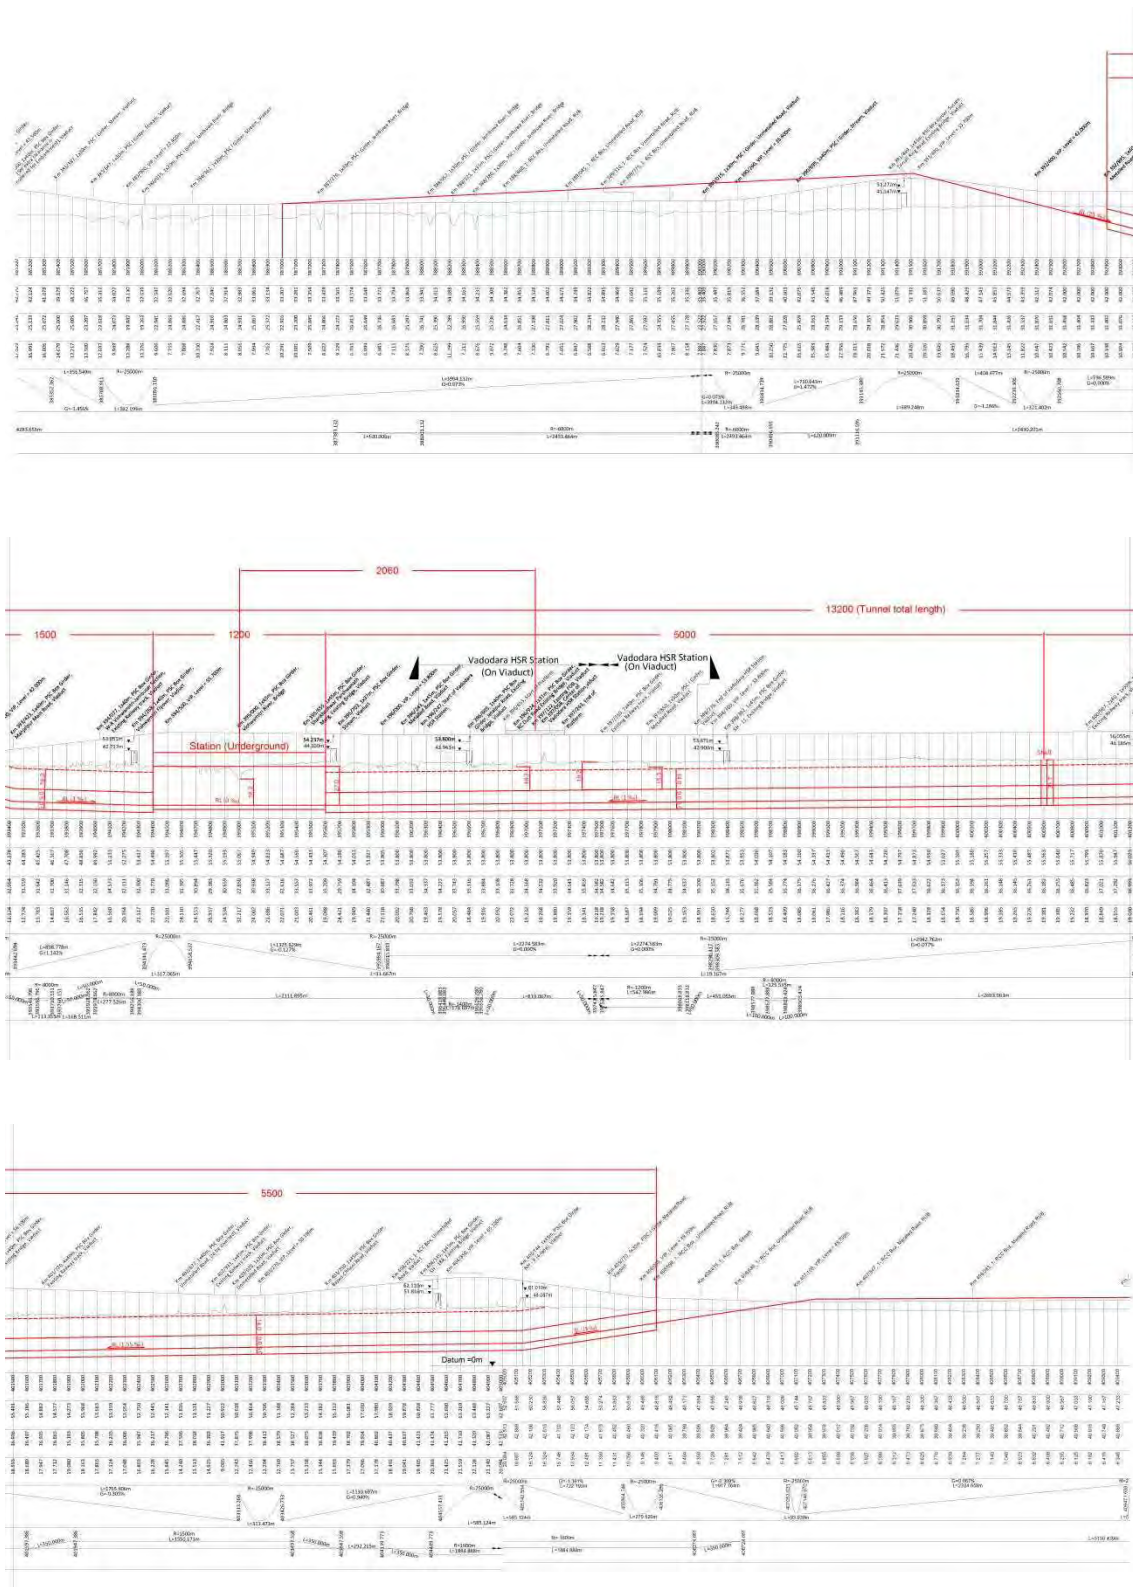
Rough Vertical Alignment for Underground & Station Relocation Plan
